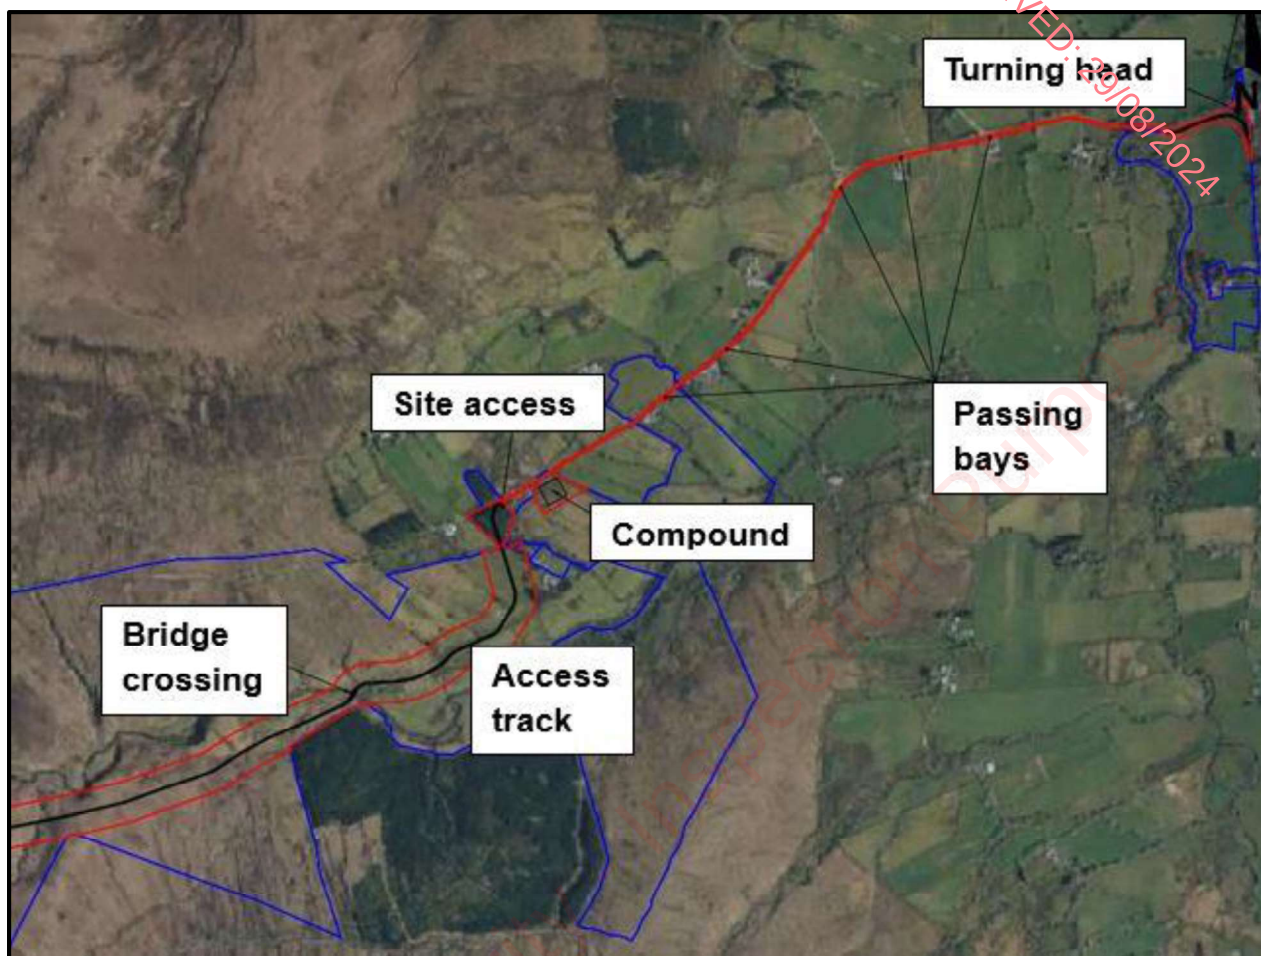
Layout of the proposed development showing location of access track, site access, turning head, passing bays, site compound and bridge crossing
